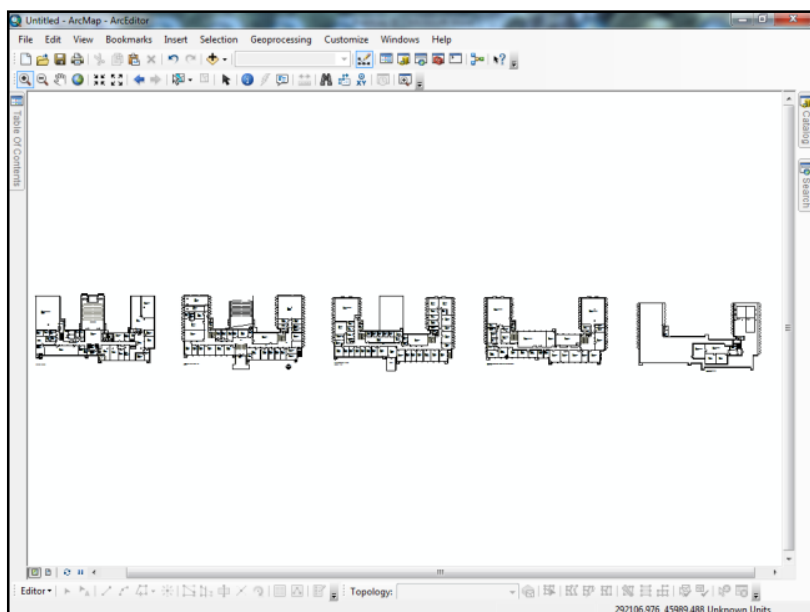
Layout of building E6 (Department of Technical Services, 2011)
